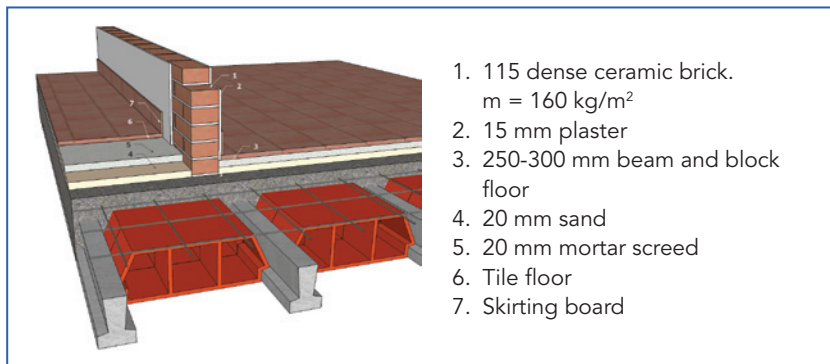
Example of typical construction from 1950's in Spain. Floor and separating wall. As it can be seen, no impact insulation layer was installed.
